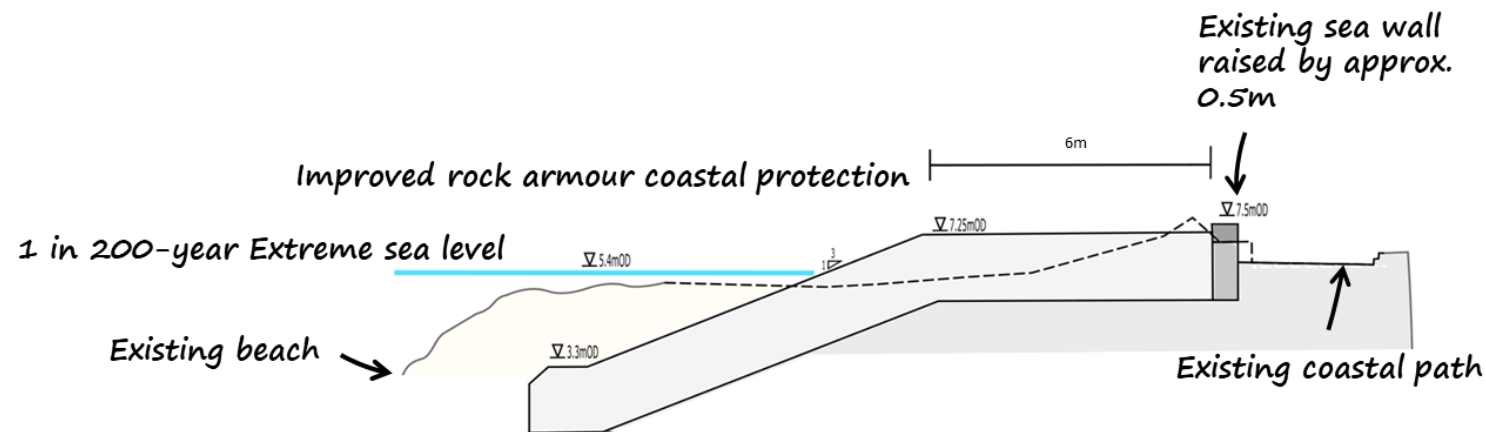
Cross section of upgraded rock armour and raised sea wall at Kinmel Bay Beach East
